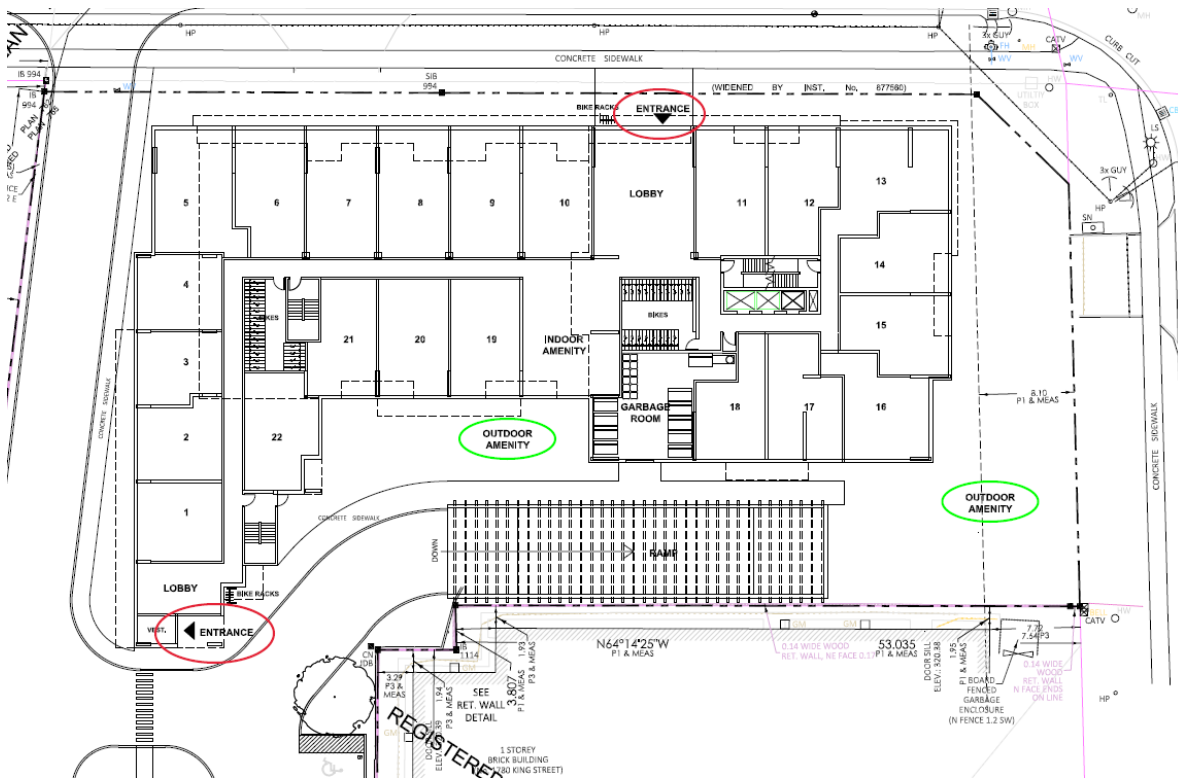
Plan indicating ground level and outdoor amenity locations of main entries/exits.
